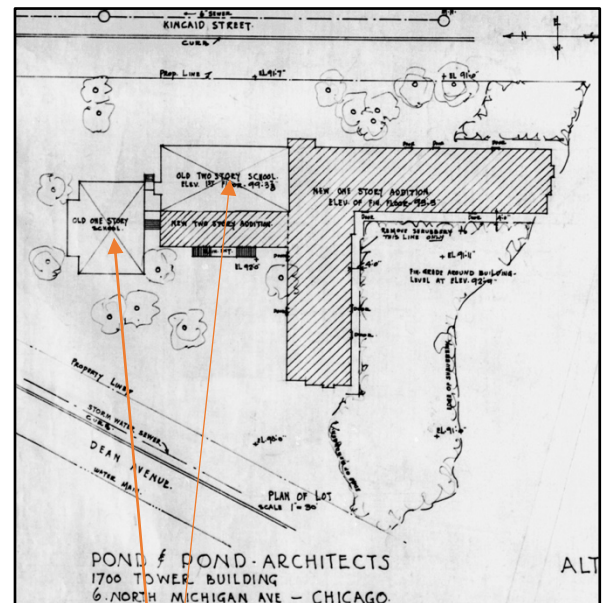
Site overview from original Pond & Pond plans including the 1897 School House, the 1913 Pond & Pond School Building and the 1925 additions (with diagonal shading), which included a new western façade and two wings. From Ryerson and Burnham Art and Architecture Archives.
